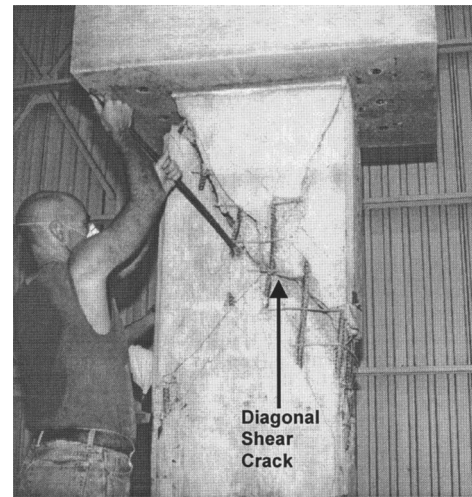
Shear failure of as-built rectangular Column RS-A1
